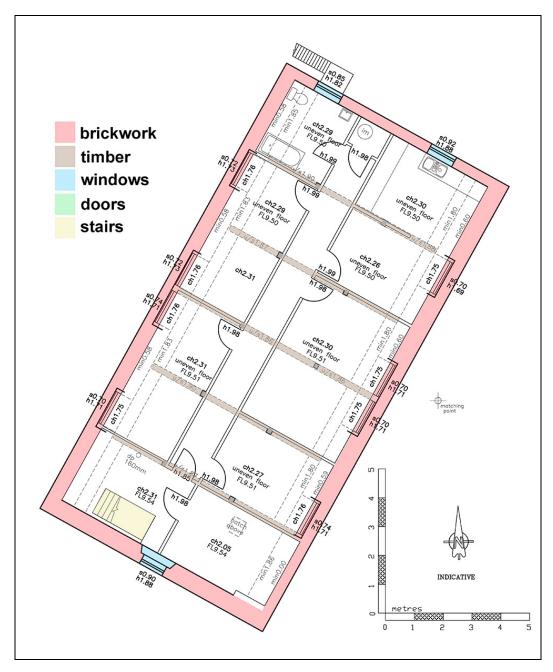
Third floor plan of Ashlett Mill showing original features (the stairs are uncertain)
